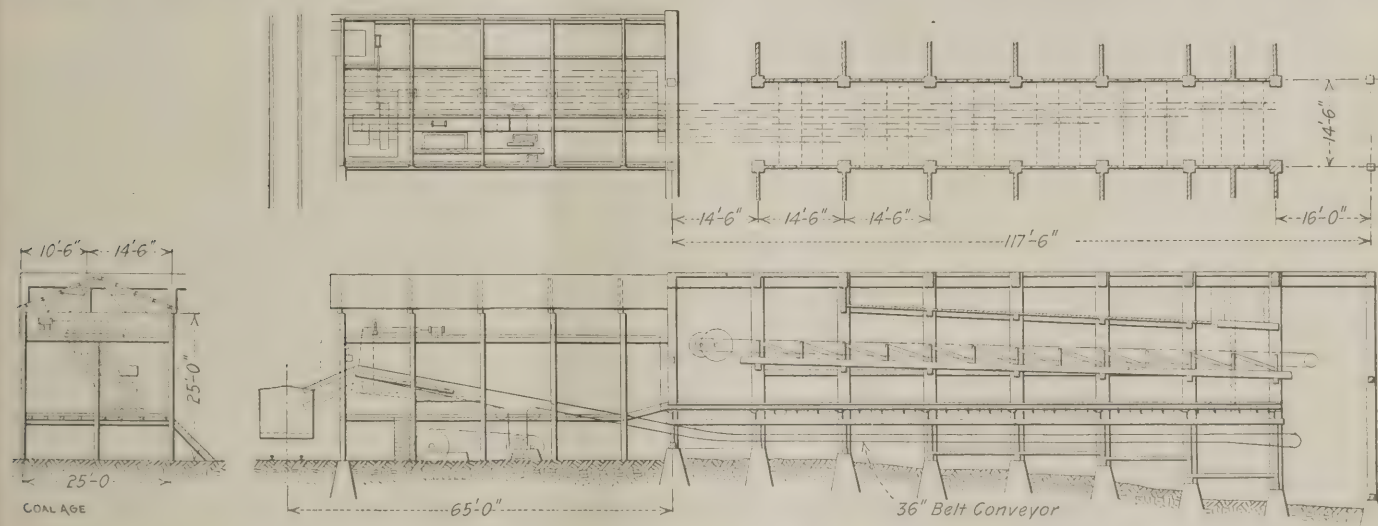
ARRANGEMENT OF STORAGE POCKETS AND BELT CONVEYOR FOR LOADING CARS
